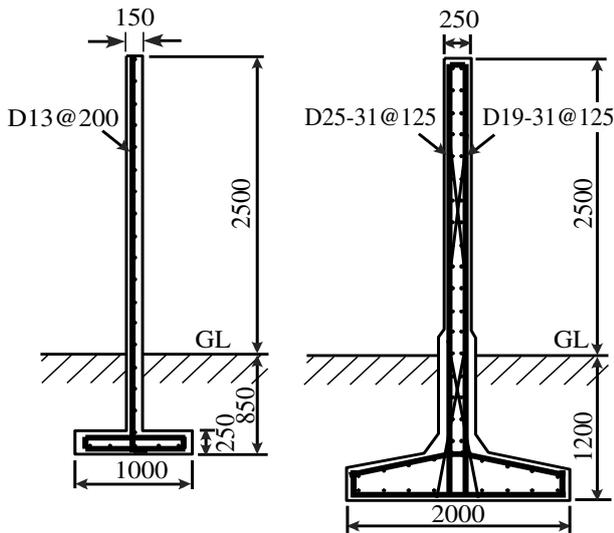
Two kinds of concrete walls. (a) conventional concrete wall for experiment #2, and (b) high-strength concrete wall for experiment #3.
